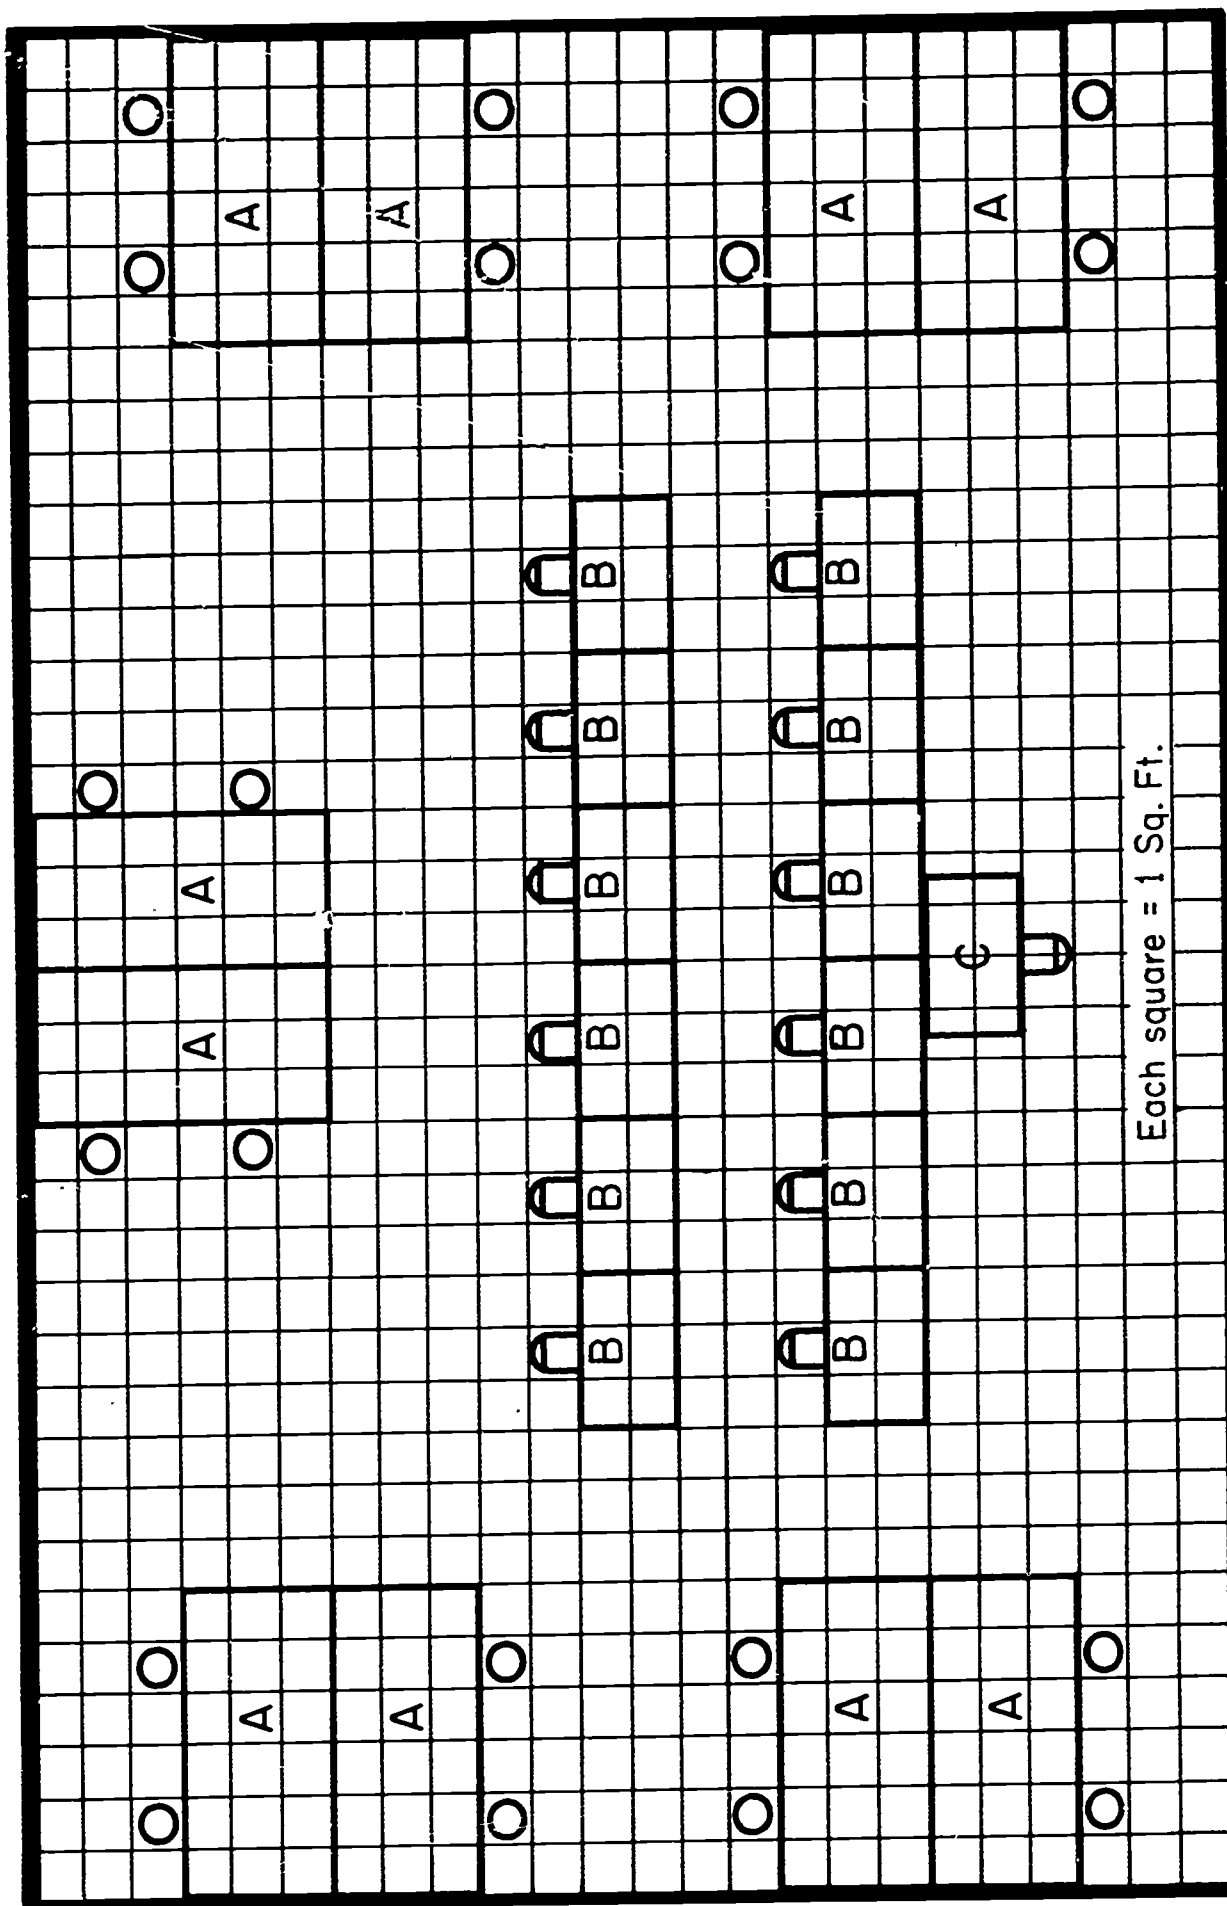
An alternate floor plan with work stations located for convenience in running power lines to work benches. Inconvenience to the instructor is a disadvantage.
